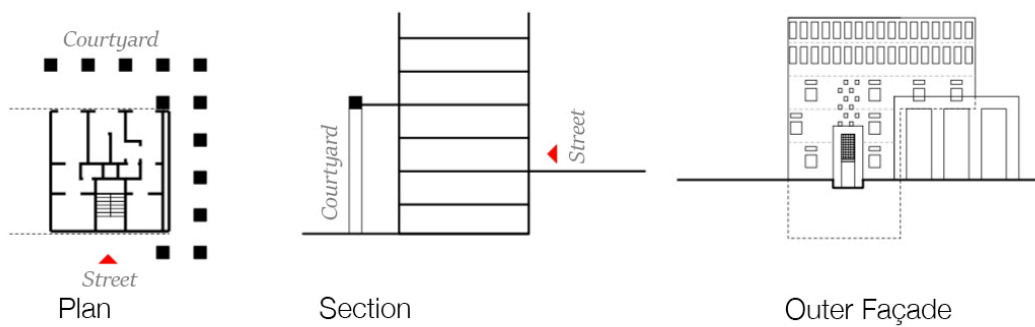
Plan, section and exterior elevation of a block with extended upper floor.
